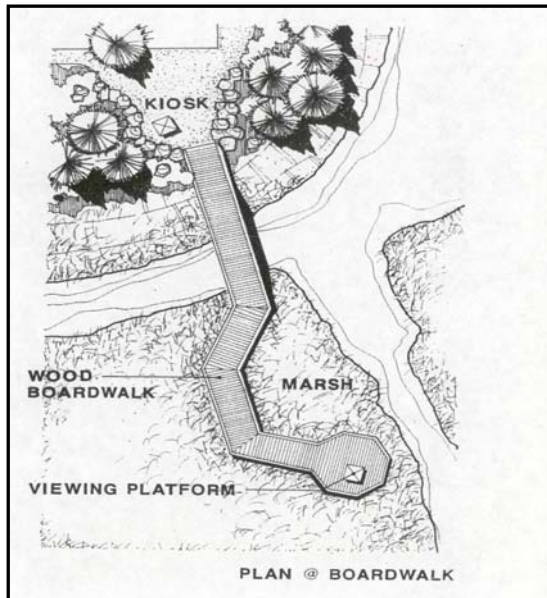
, Boardwalk Site Plan from Ocean Beach Park Master Plan; 1988
